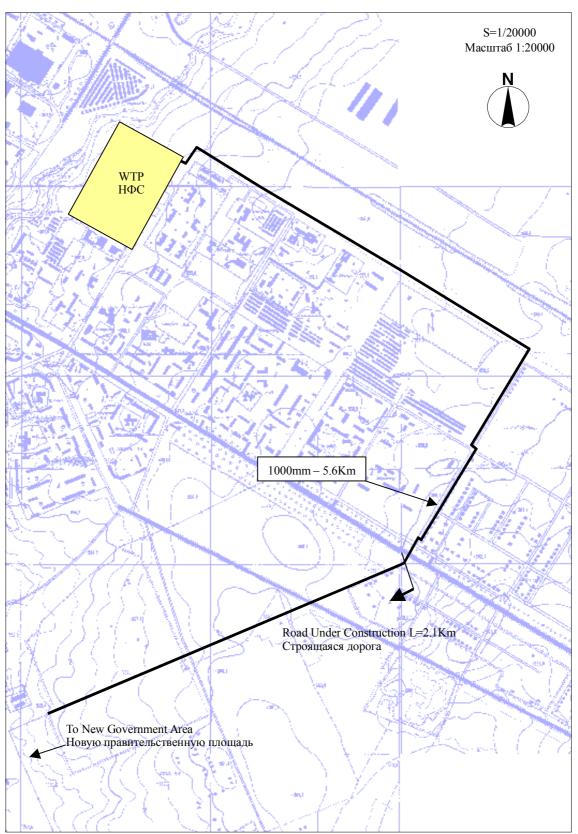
General Plan of the Distribution Main to New Government Area Чертеж 5.4.1 Генеральный план Распределительного Водопровода Новой Правительственной Площади
